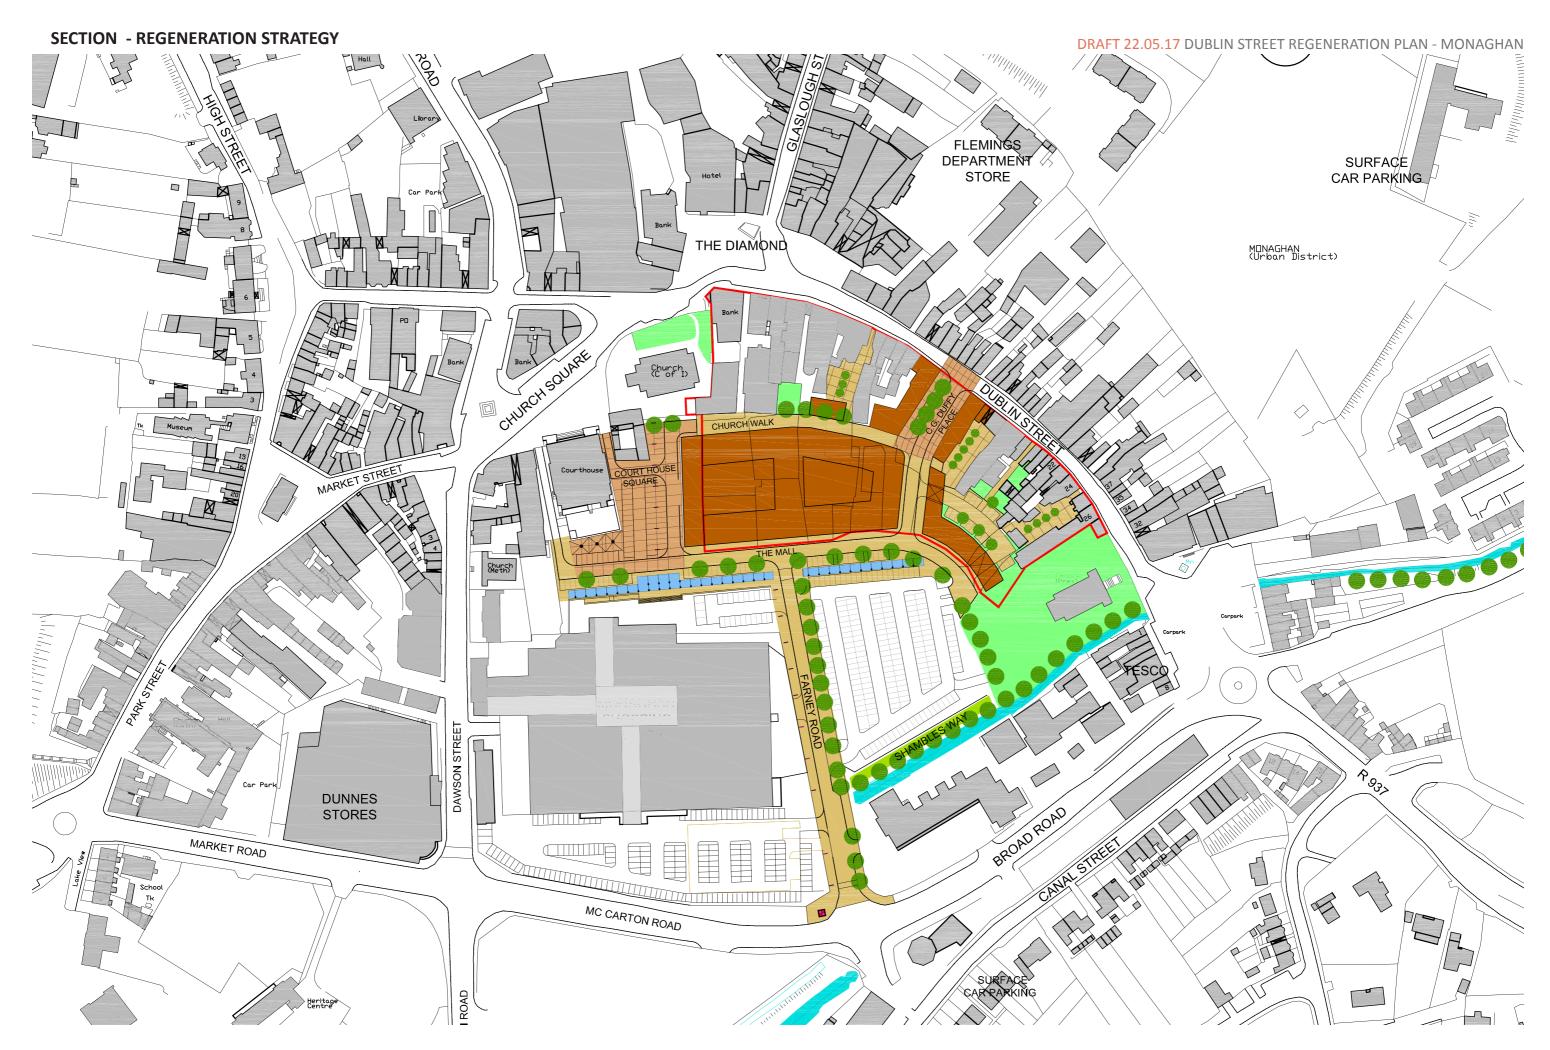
Dublin Street Regeneration Plan_Overall Plan
